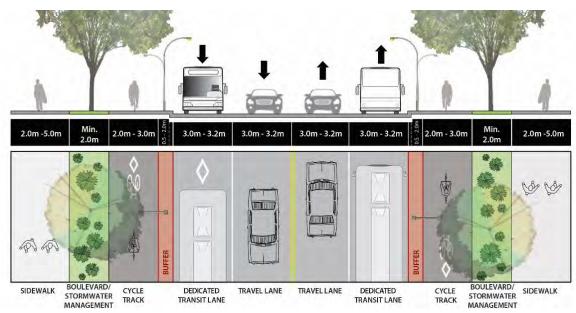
Shelbourne Street Right-of-Way Long-Term Ultimate Design Concept
